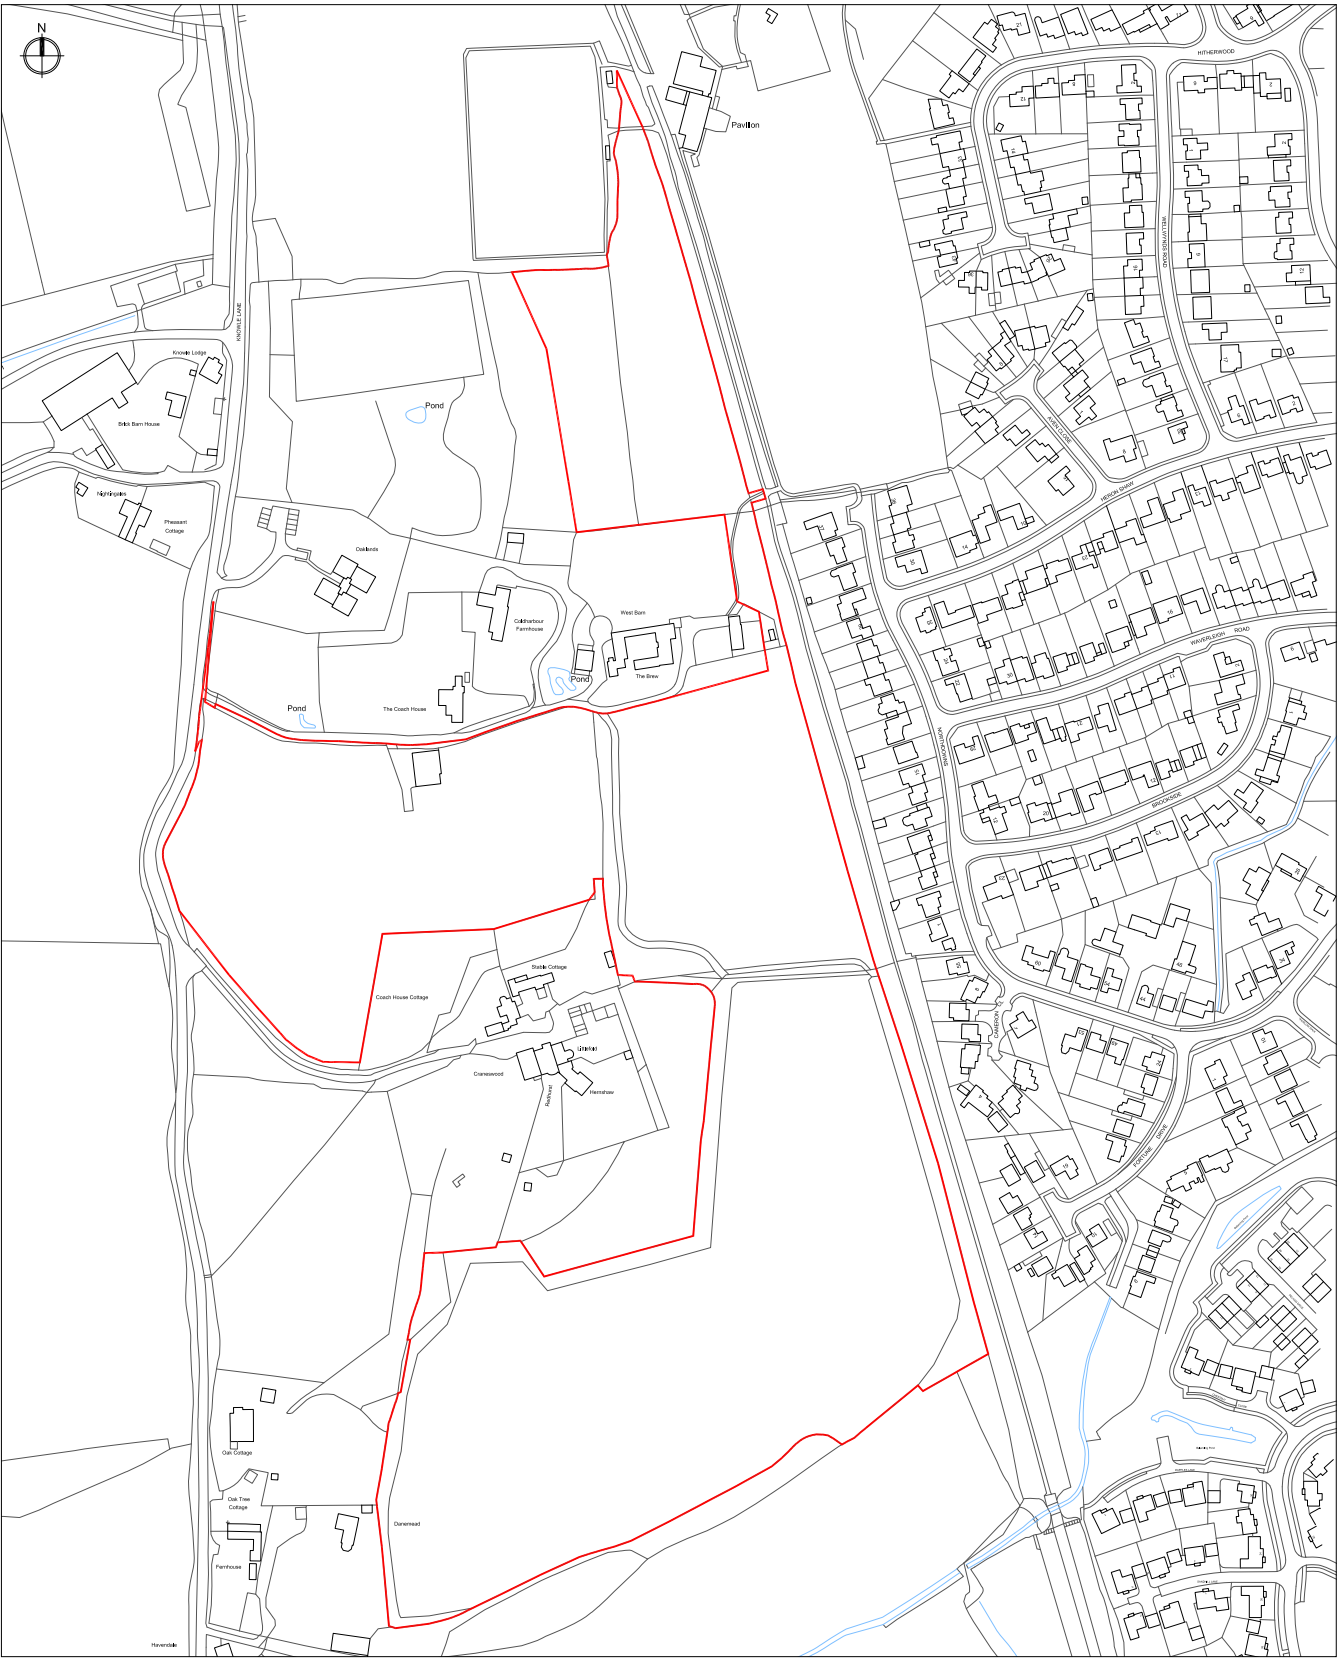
Site Location Plan (Application drawing ref 1321.01)
